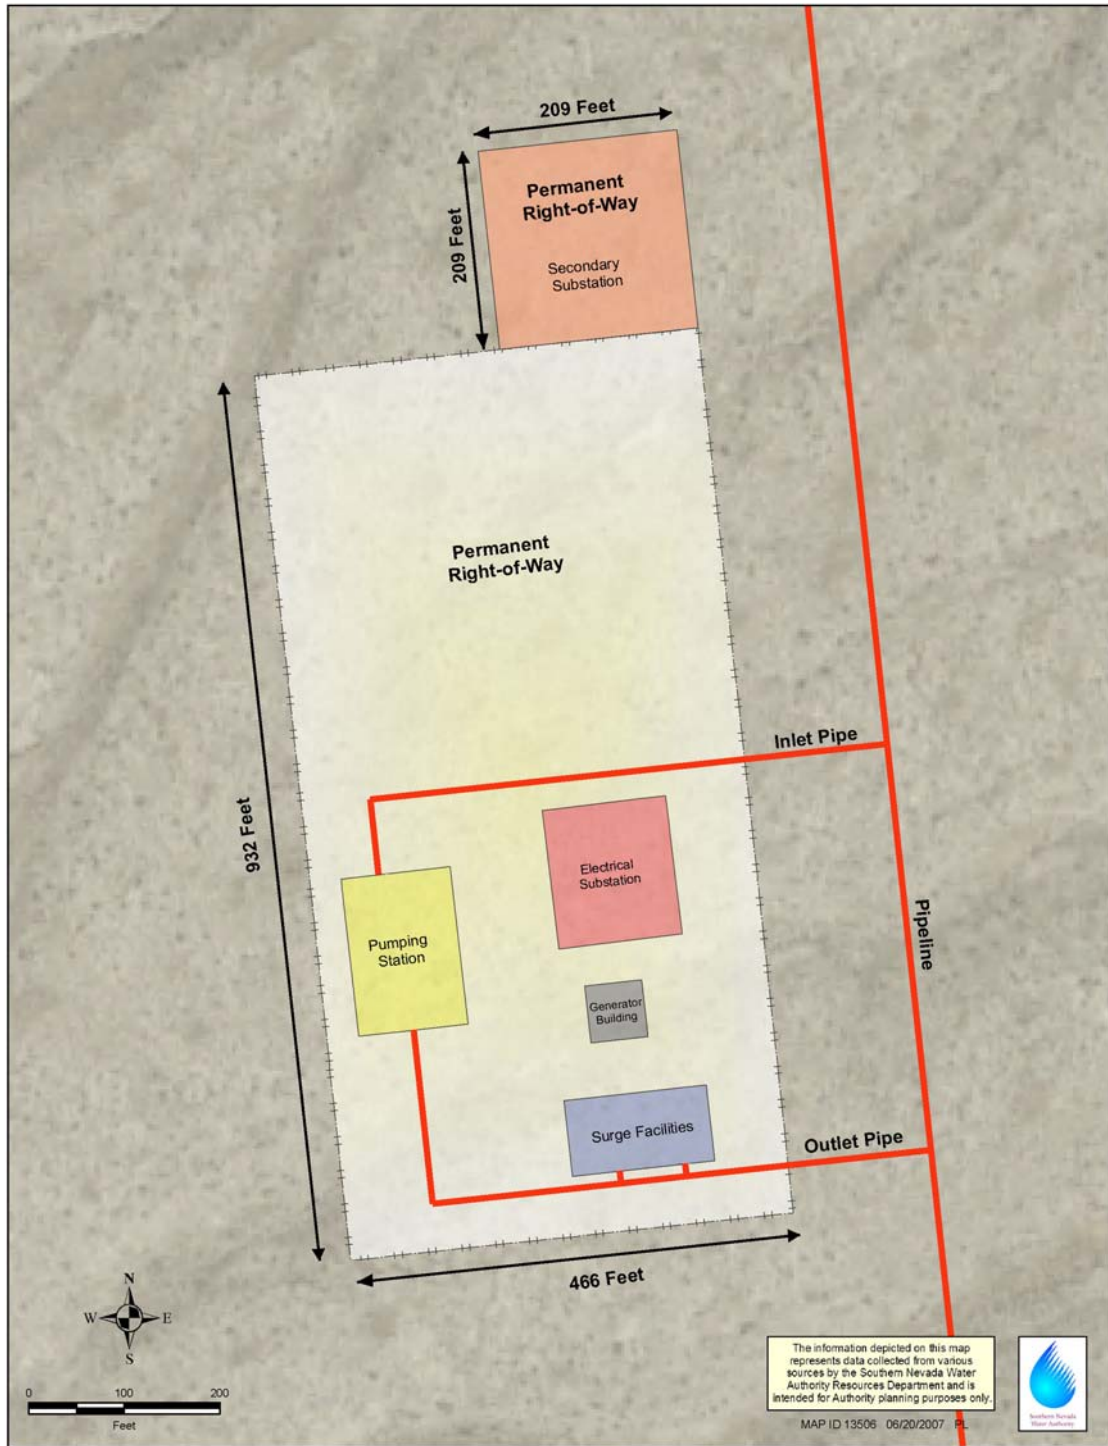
Preliminary Snake Valley South Pumping Station Site Plan
